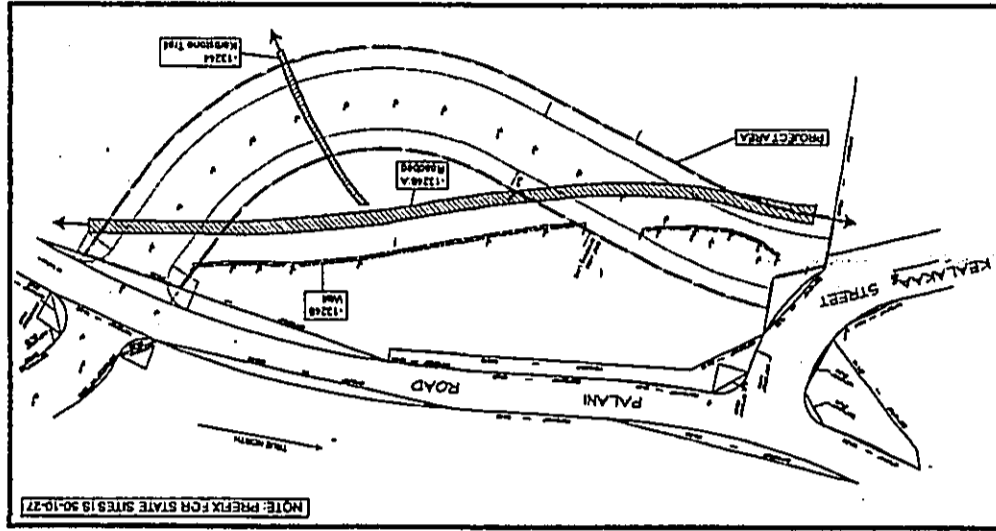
Site Plan of the Project Area Showing the Surveyed Wall Location and Approximate Locations of the Old Palani Roadbed and Kerbstone Trail.
